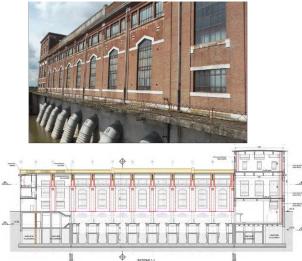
Siro Pumping Station, St. Benedetto Po, Mantova (Italy)
